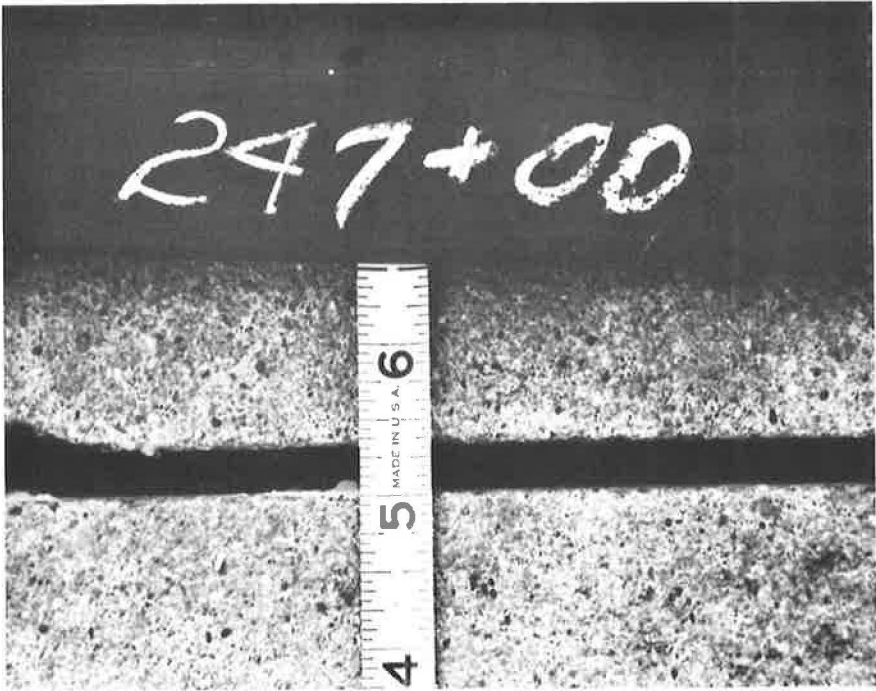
Example of type of photograph from which measurements of joint and crack openings were made.
